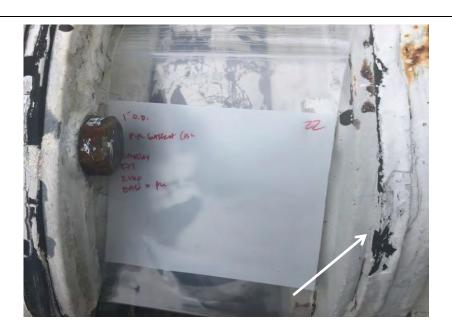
Samoa – 1 MG reservoir – Paint (white) located at roof east handrail reported to contain lead. -
